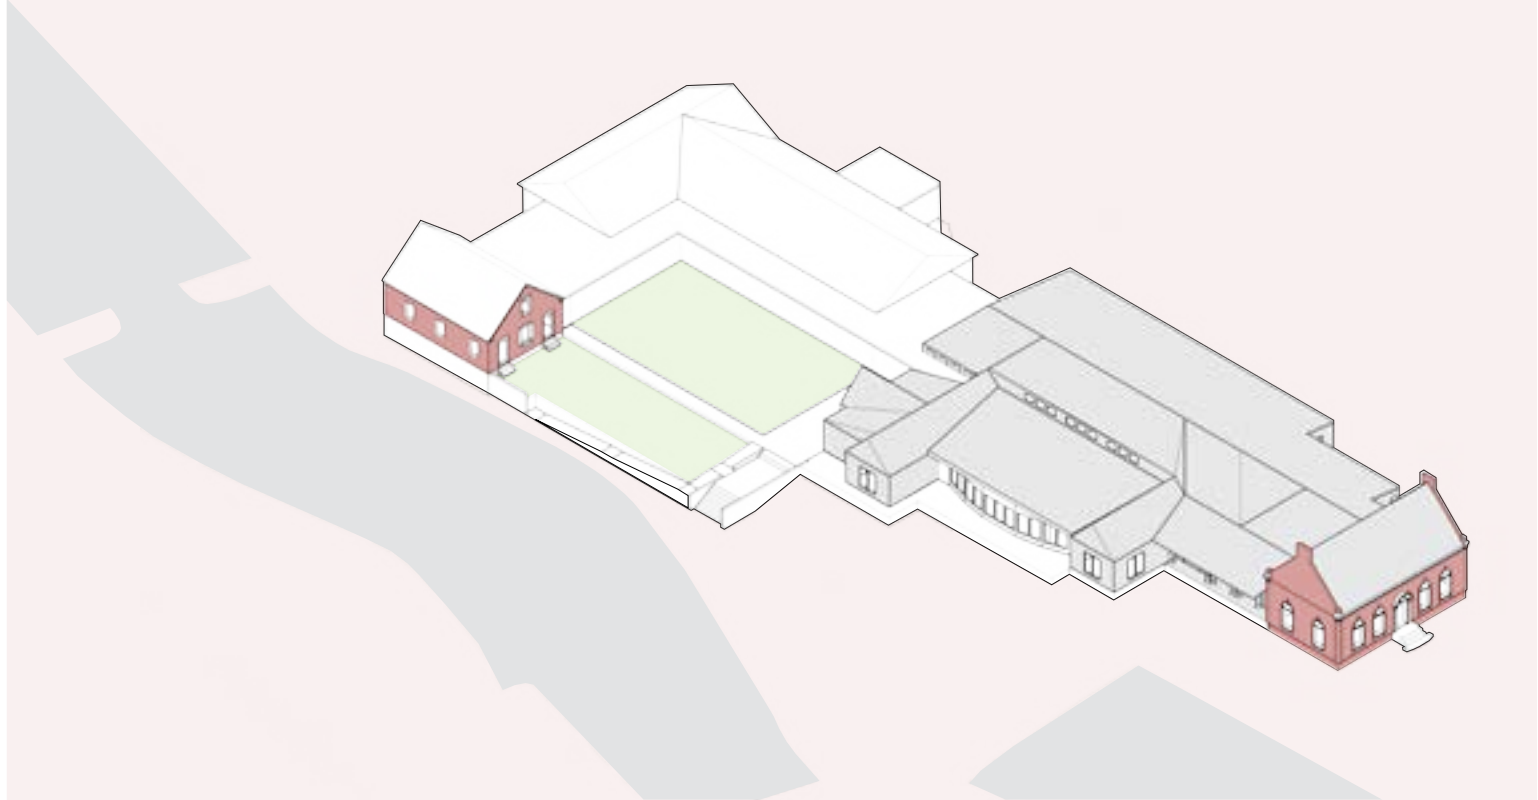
Room and building arrangement, 1855. Tobias Walker Farm.
